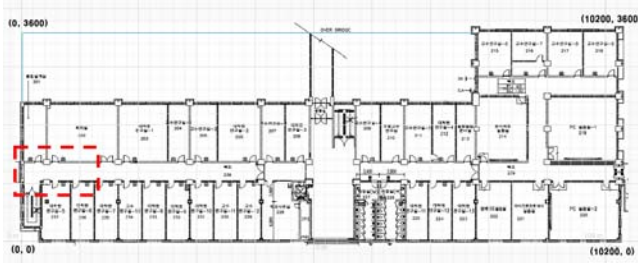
FIGURE VII. POSITION METRIC OF A FLOOR OF WHOLE BUILDING
